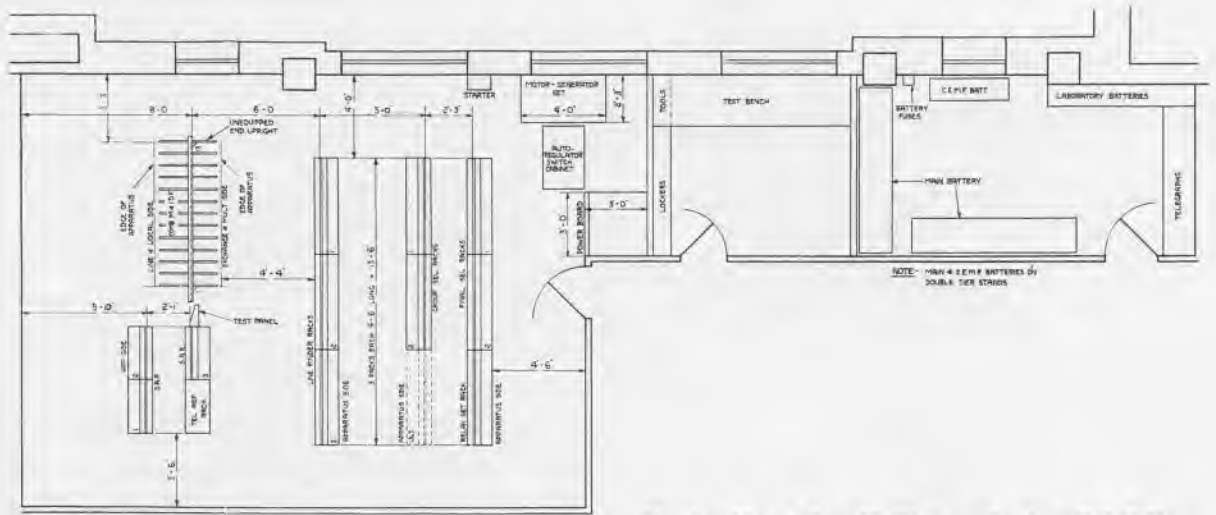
Floor Plan, Wellington Station, P.A.B.X.
